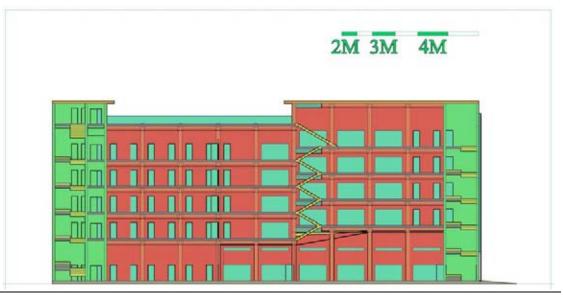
section of the building -- left hand side is east and the other is west
